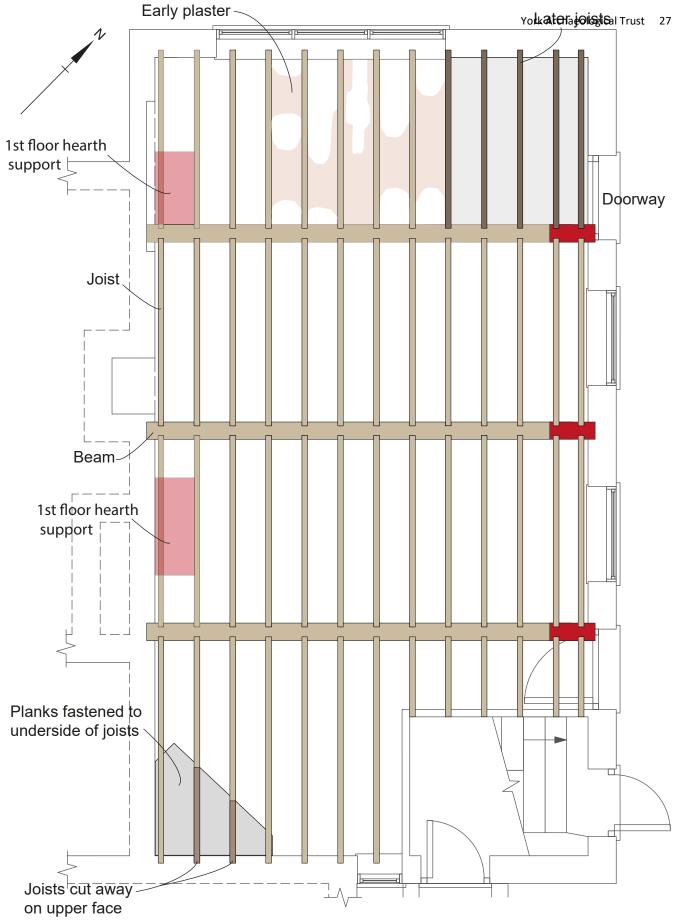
Features in ground floor ceiling 1:50 (After Native Architects, Drawing 305)
